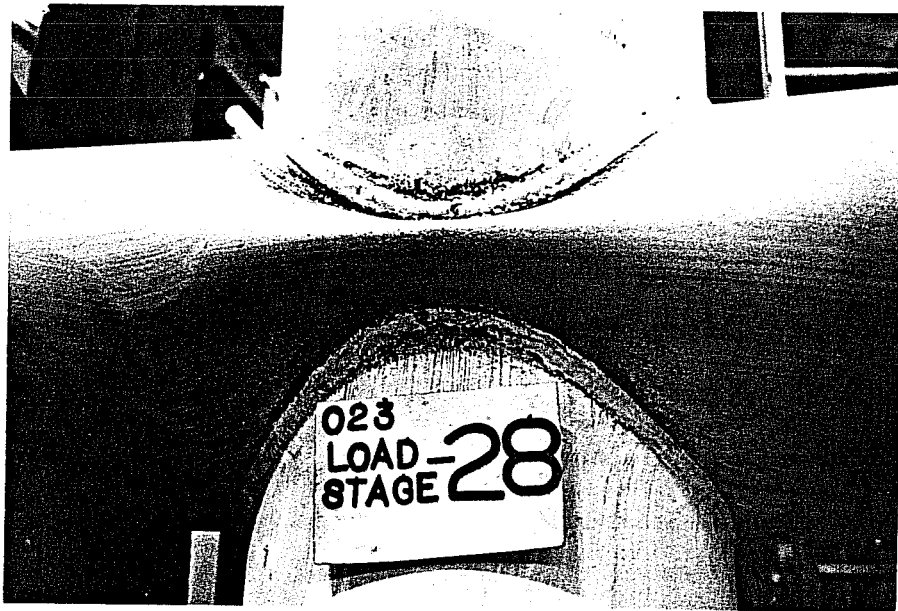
Picture of Joint Distortion in Specimen 023
